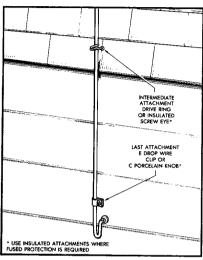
Drop Wire Crossing Wood or Stucco on Wood Building Projection
